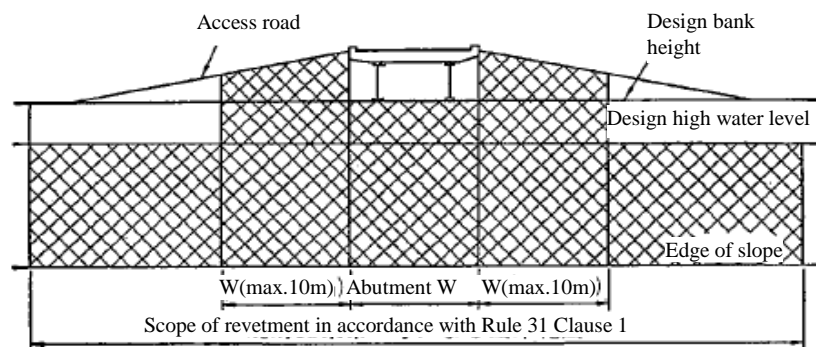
Height of revetment necessary for establishment of a bridge
